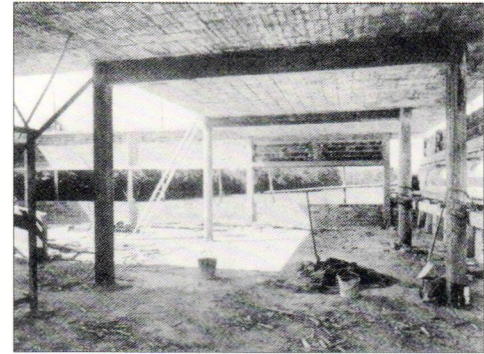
Construction of the living room of the Villa Savoie, Poissy. Note infill masonry wall in progress at far right.
